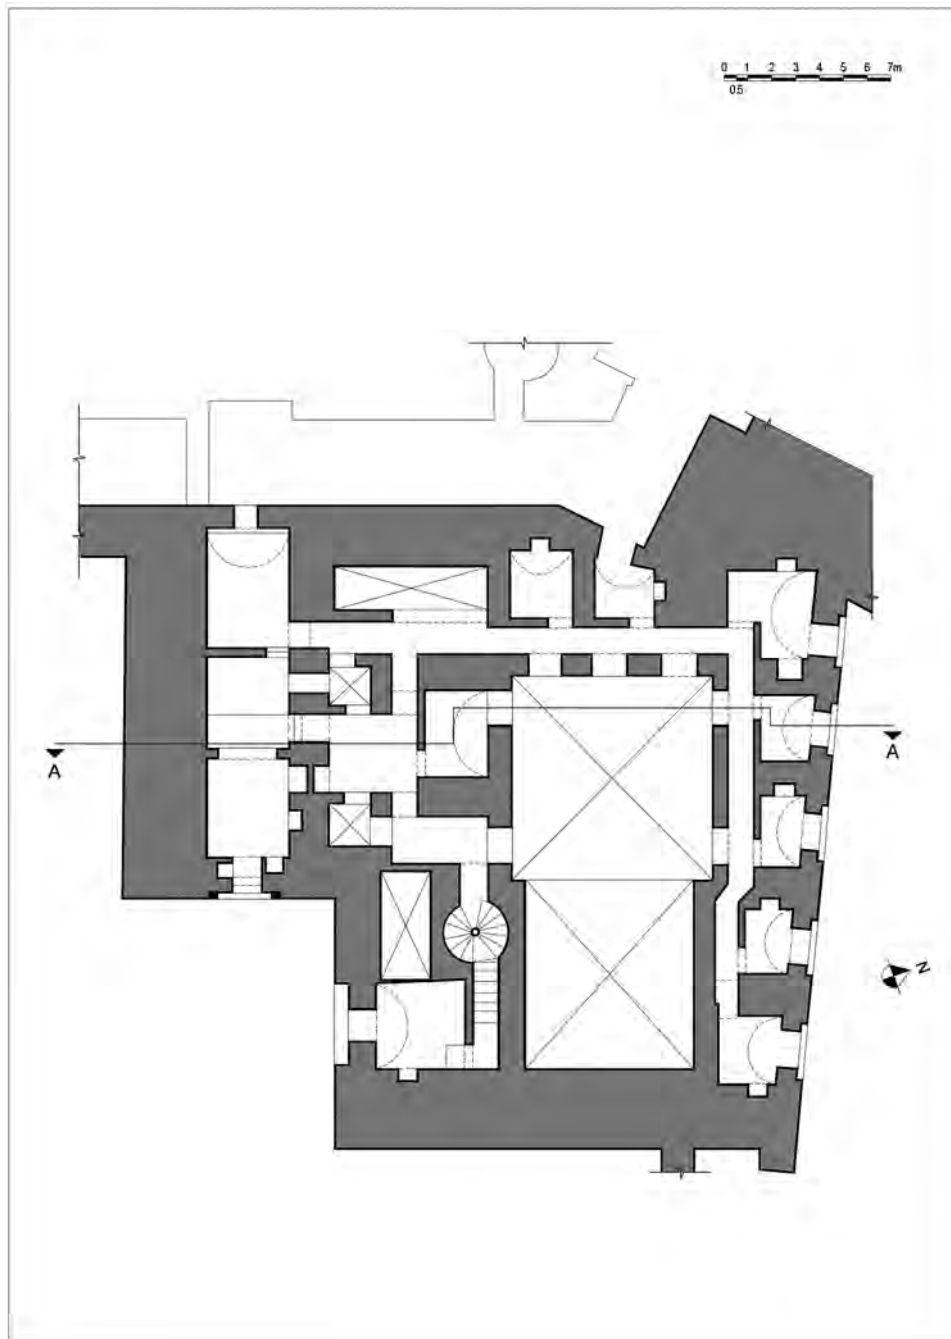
Mālikīyah Madrasah, Complex of Sultan Ḥasan, Cairo, second floor plan (H. Al-Harithy)
